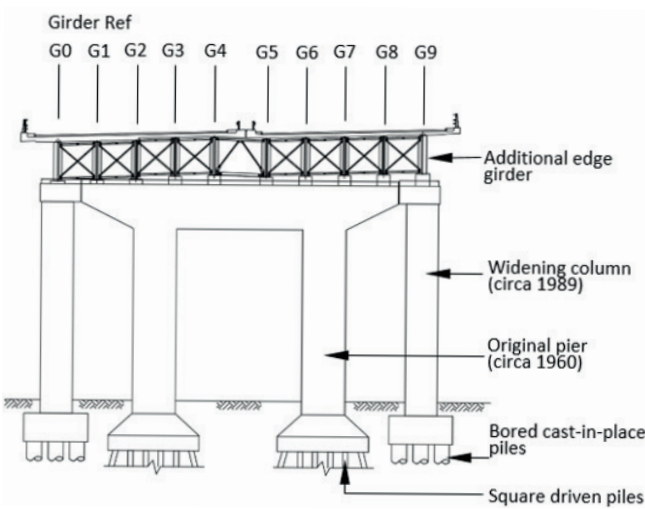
Section through BHLB approach spans showing the original piers and additional widening columns
